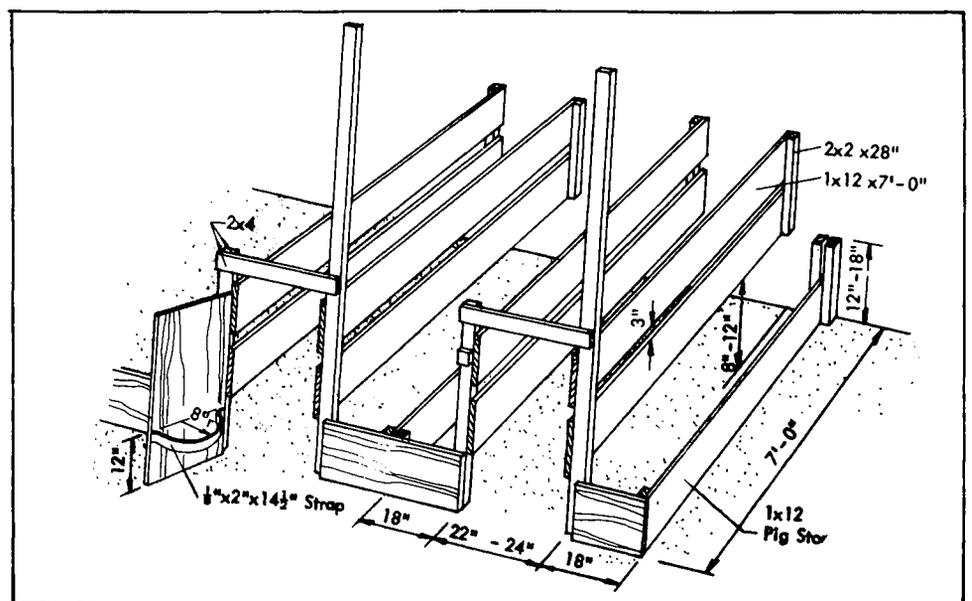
Wooden constructed farrowing stall can be built to fit portable or permanent swine house.
